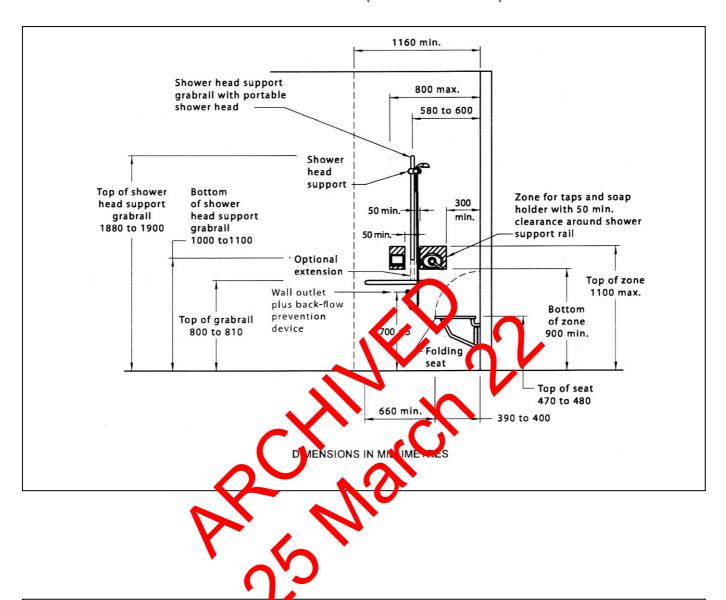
SHOWER RECESS FITTINGS - ELEVATION (SOURCE: AS 1428.1)
